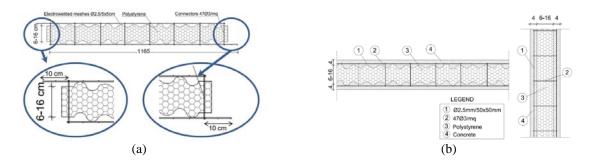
(a) Horizontal section of the modular panel and the special design of the ends. (b) The *sandwich cast in situ squat concrete wall*.
